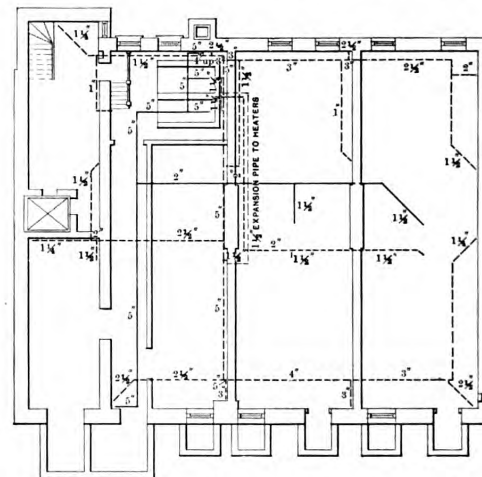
Basement, Showing Location of Boilers, Risers and Returns.
